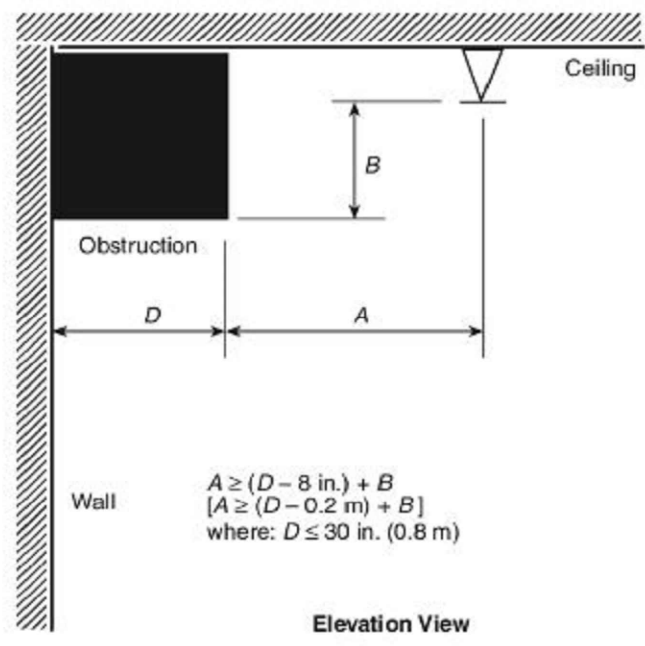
Positioning of Sprinkler to Avoid Obstruction Against Wall (Residential Upright and Pendent Spray Sprinklers).
